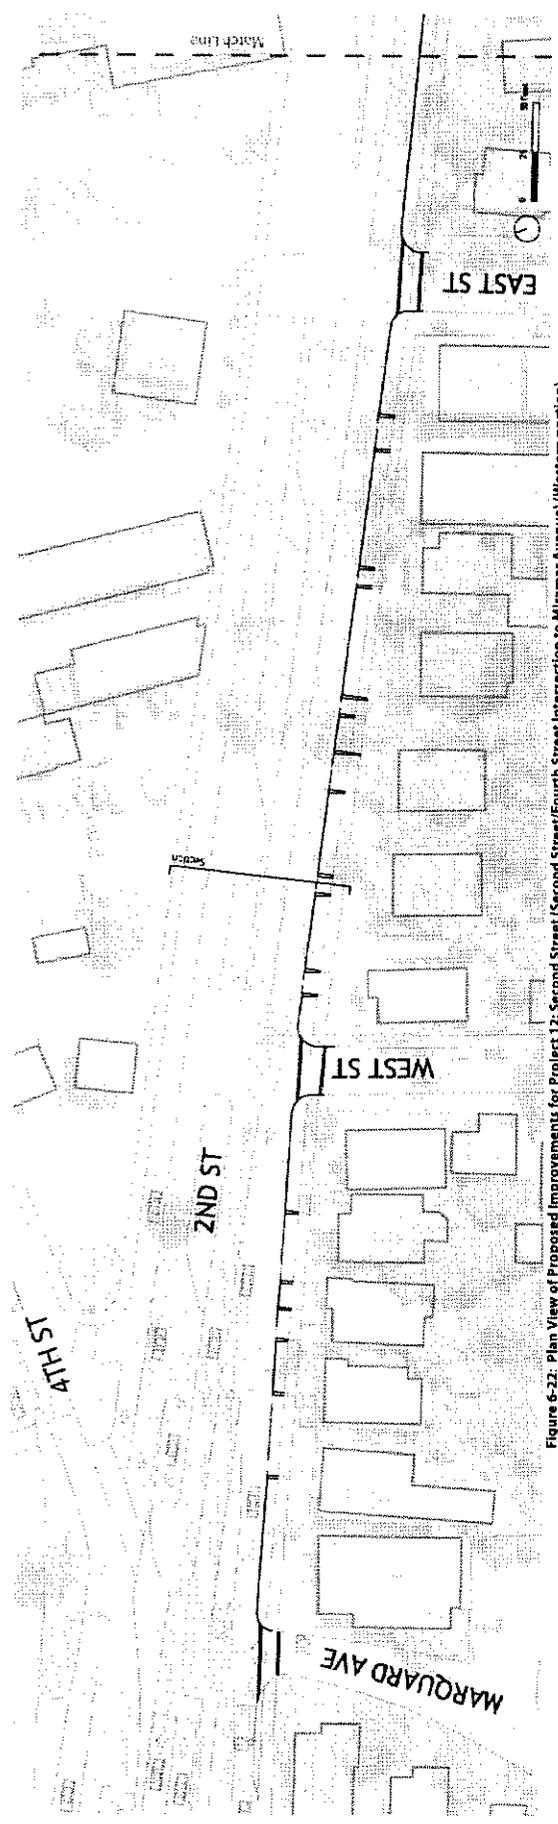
Plan View of Proposed Improvements for Project 12: Second Street (Second Street/Fourth Street Intersection to Milamar Avenue) (Western portion)
